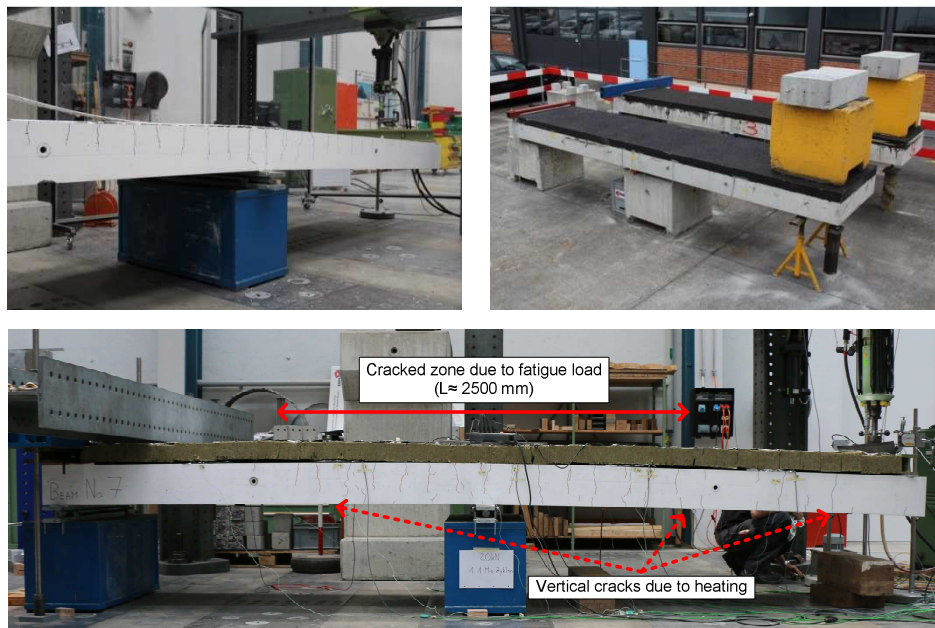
Cantilever static loading test to failure (upper left), cantilever test with asphalt under sustained load (upper right), cantilever fatigue test under elevated temperature (with heating mats) (bottom).
